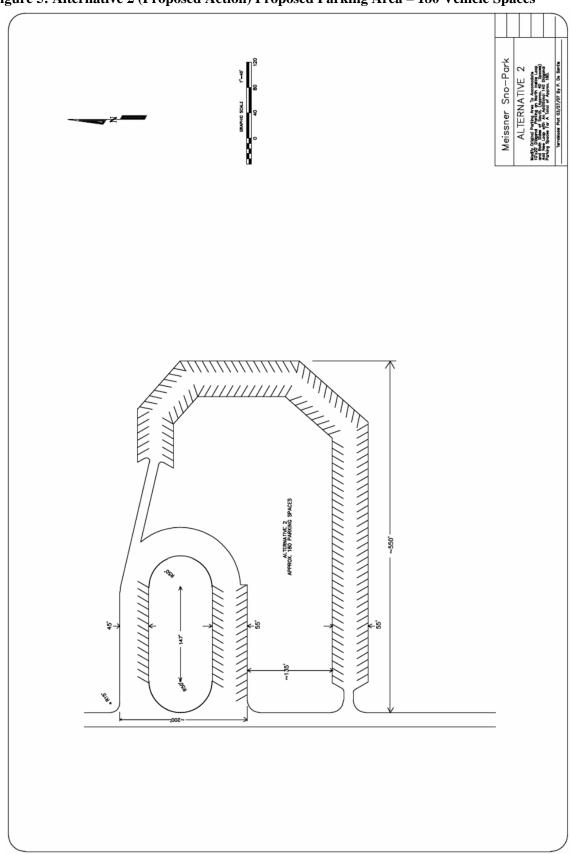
Alternative 2 (Proposed Action) Proposed Parking Area – 180 Vehicle Spaces
